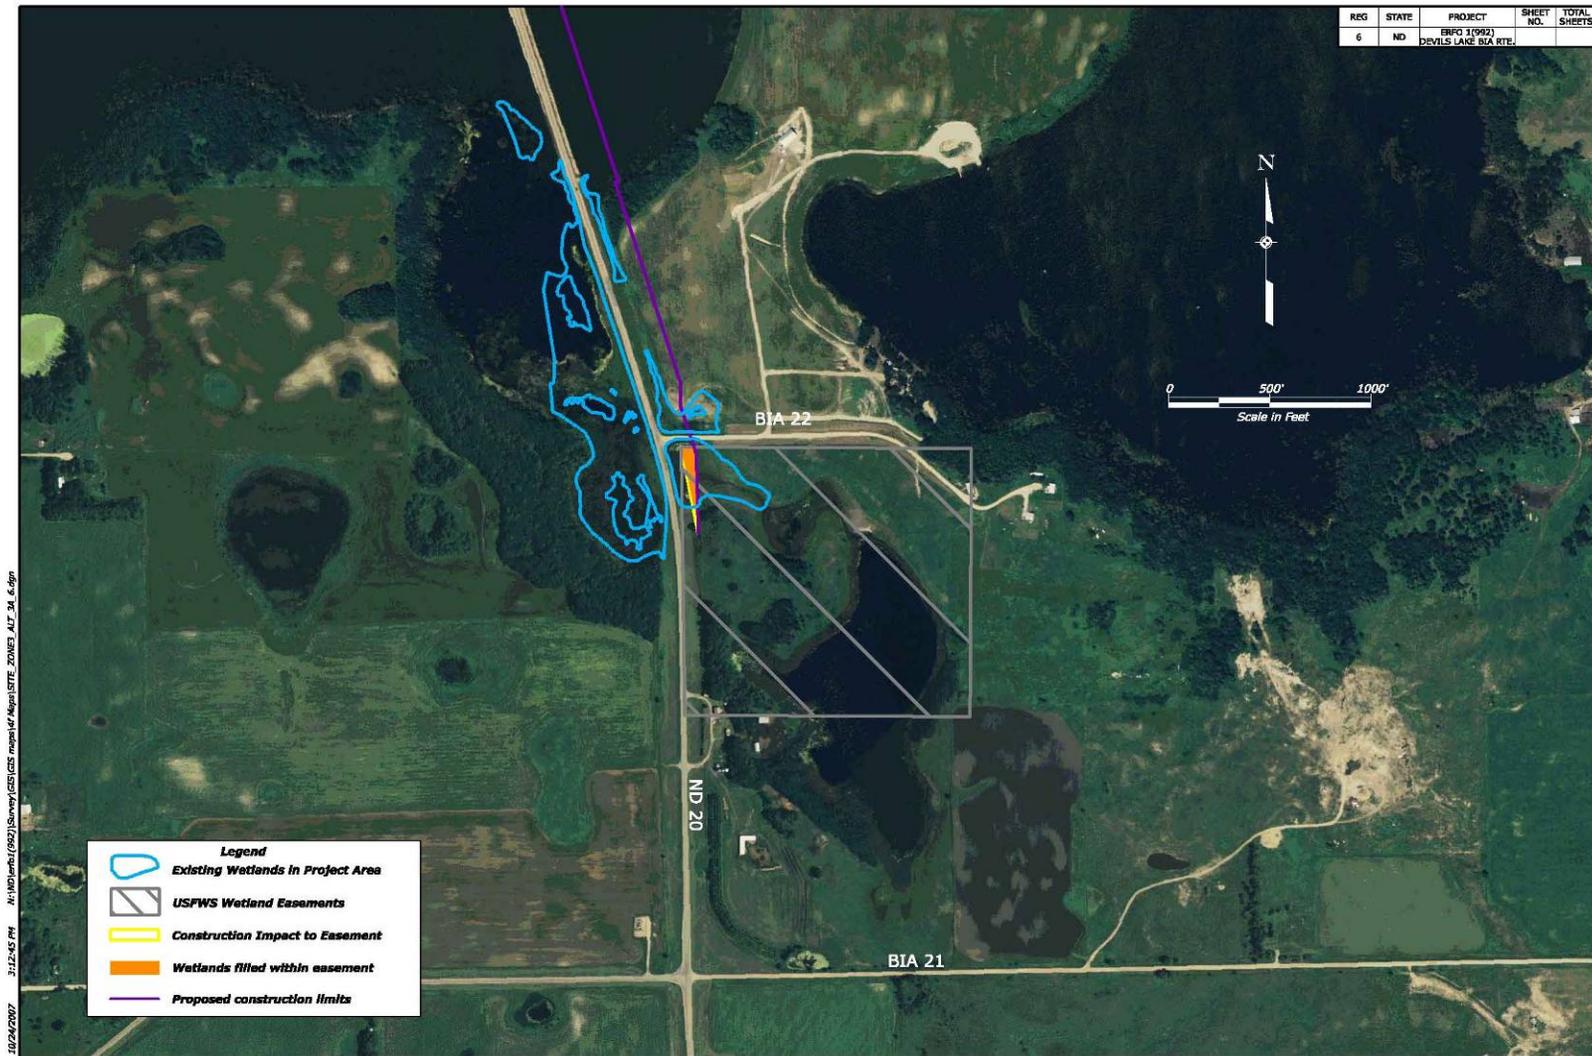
Zone 3 Alternatives 3-A and 3-B – Wetland Easement Tract Site 6.
